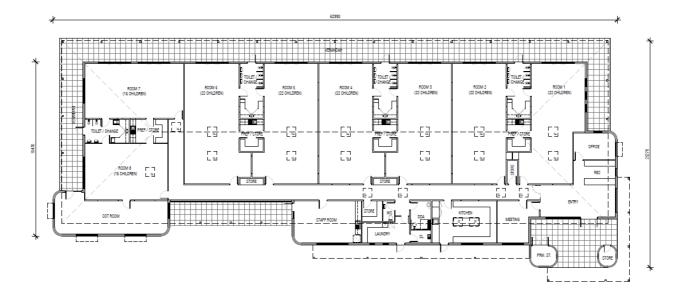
Proposed floor plan for childcare centre. Source: Application documents
